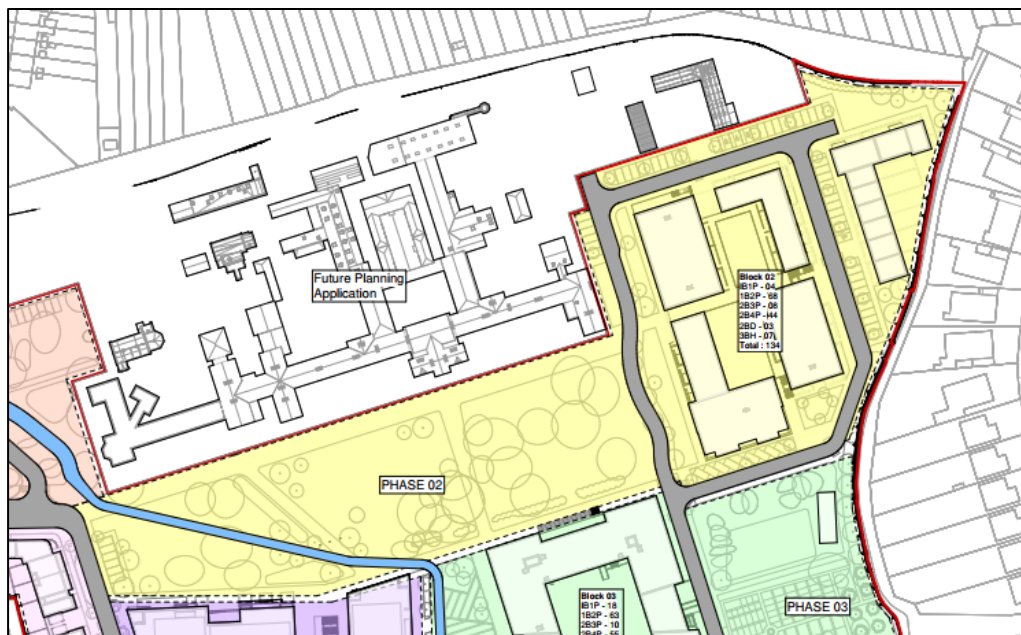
Apartment Block Construction to east of Main Hospital Building.
